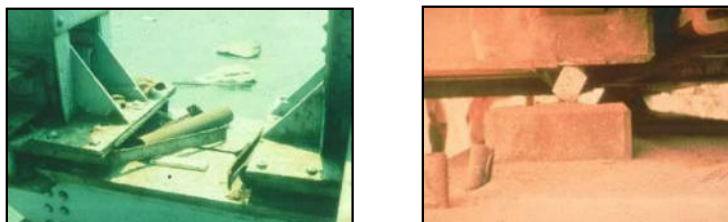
Dislodged Roller and Excessive Tilt in Rocker
